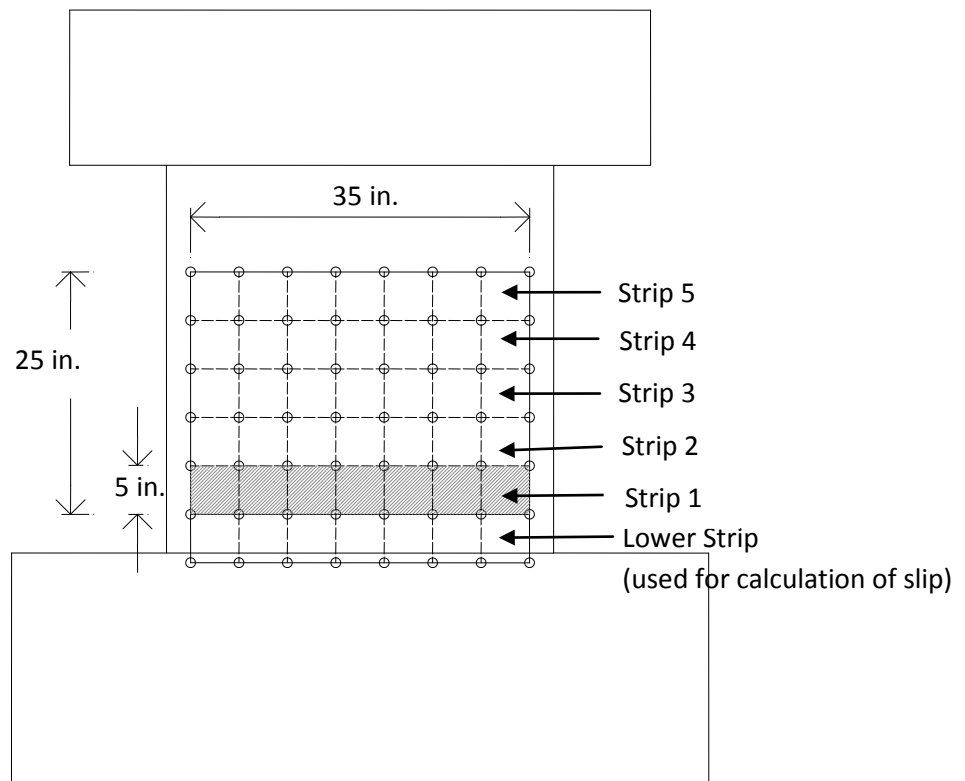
Definition of "Longitudinal Strips" in Wall Specimen
